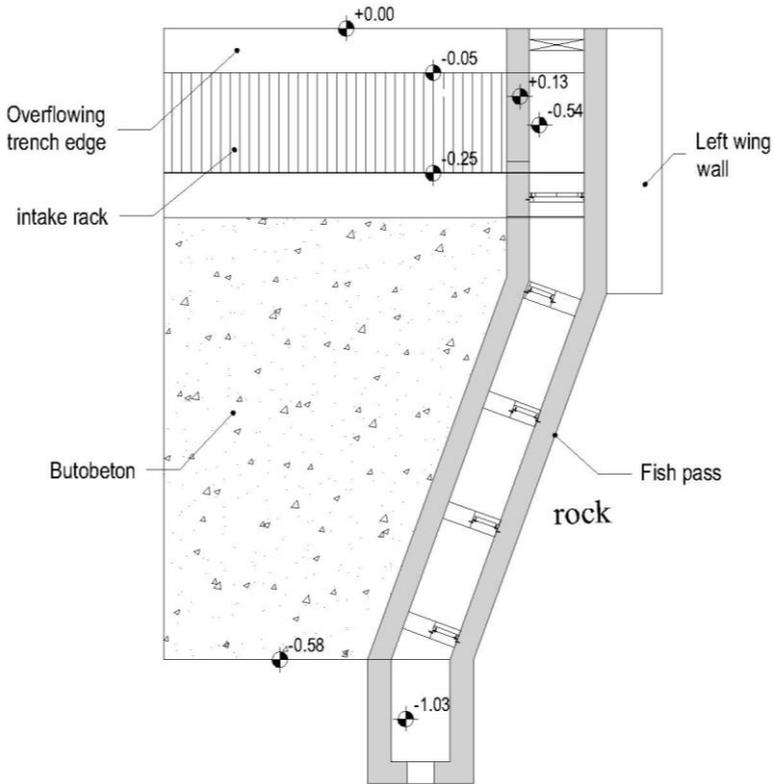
Pool pass with surface notches at the walls between the pools – layout
